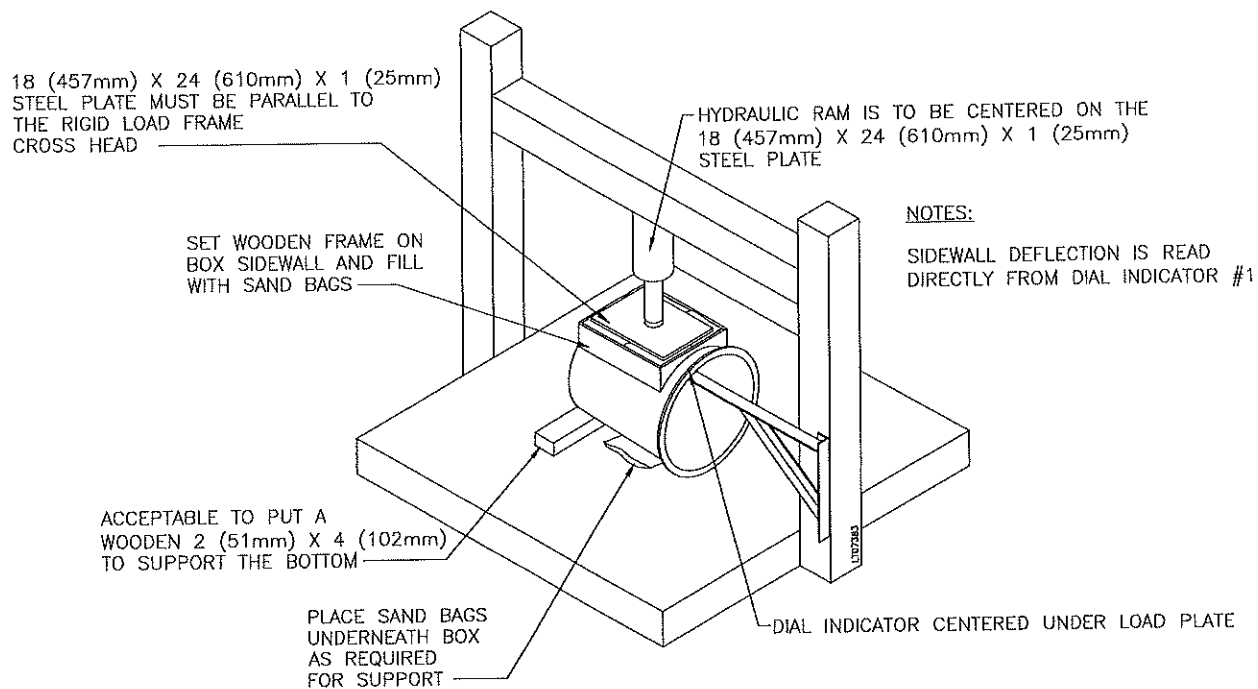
Vertical Sidewall Load Test for Round Enclosures (Tier 22)
